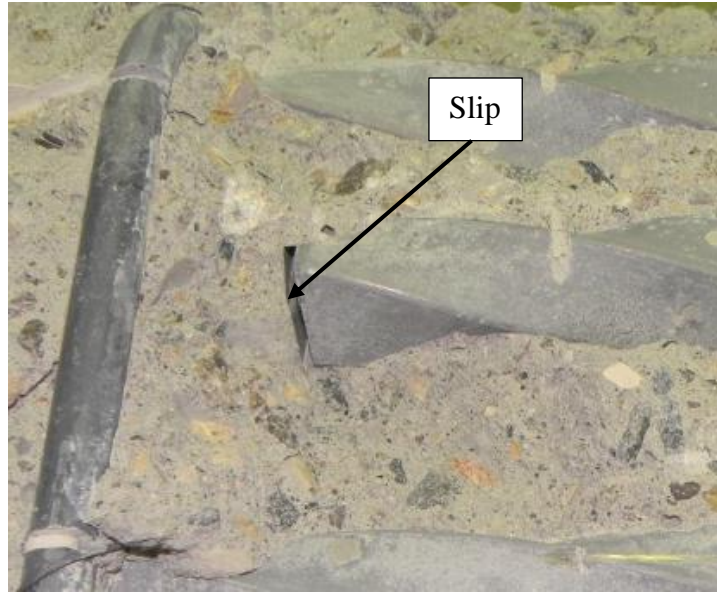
End Slip of Longitudinal Reinforcement Following Concrete Removal for Specimen 25♦-610↓
